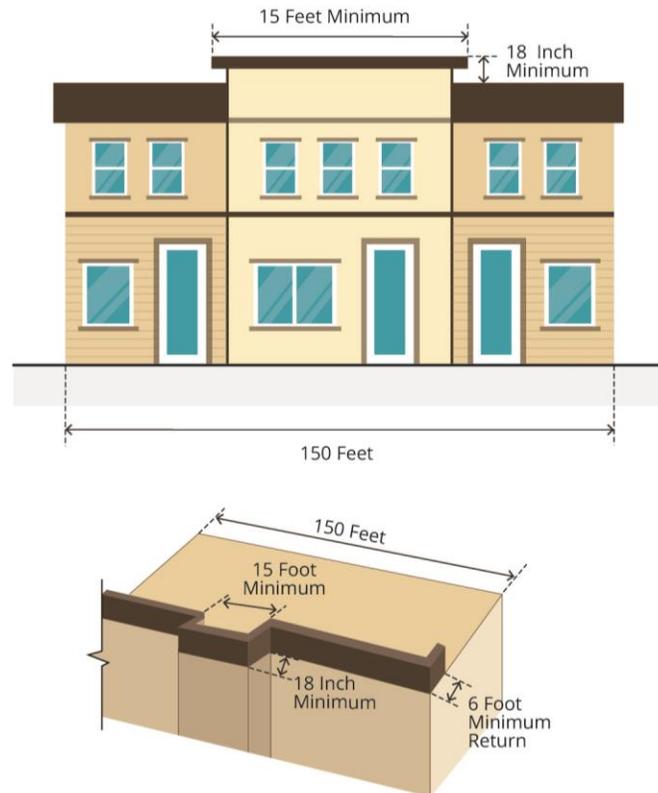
D MIXED USE BUILDINGS, ROOF LINE
